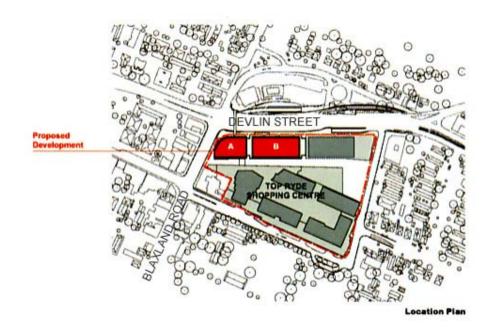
Site plan showing the location of the proposed Top Ryde Shopping Centre Redevelopment – Commercial Buildings A & B
